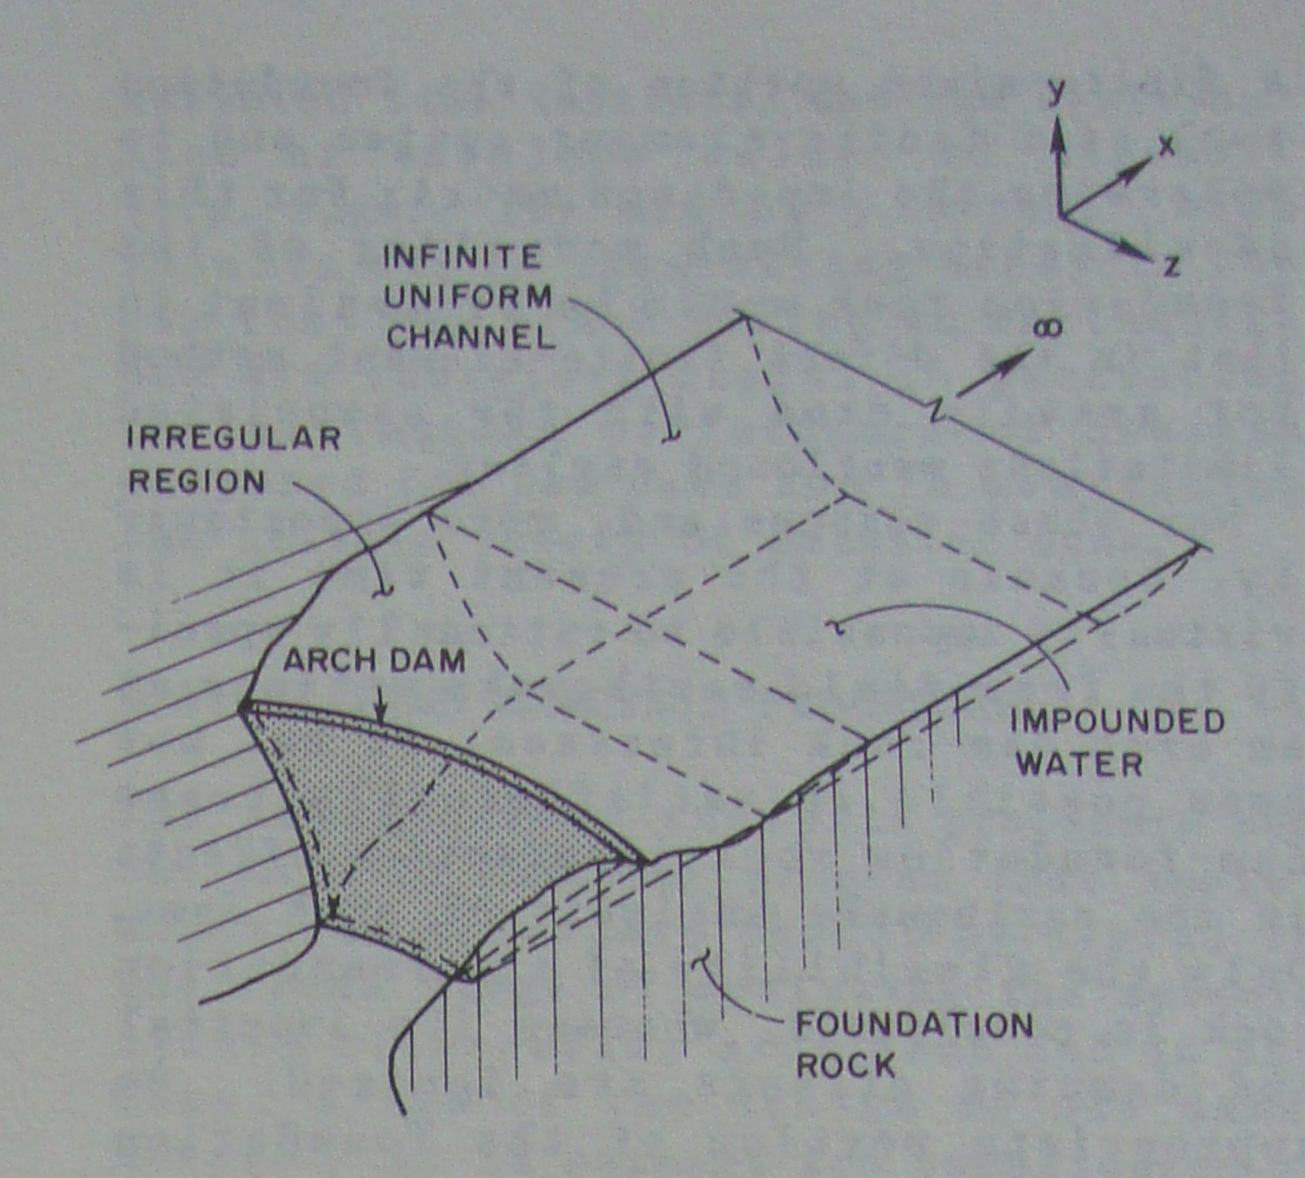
Arch dam-water-foundation rock system (Fok and Chopra 1985)
